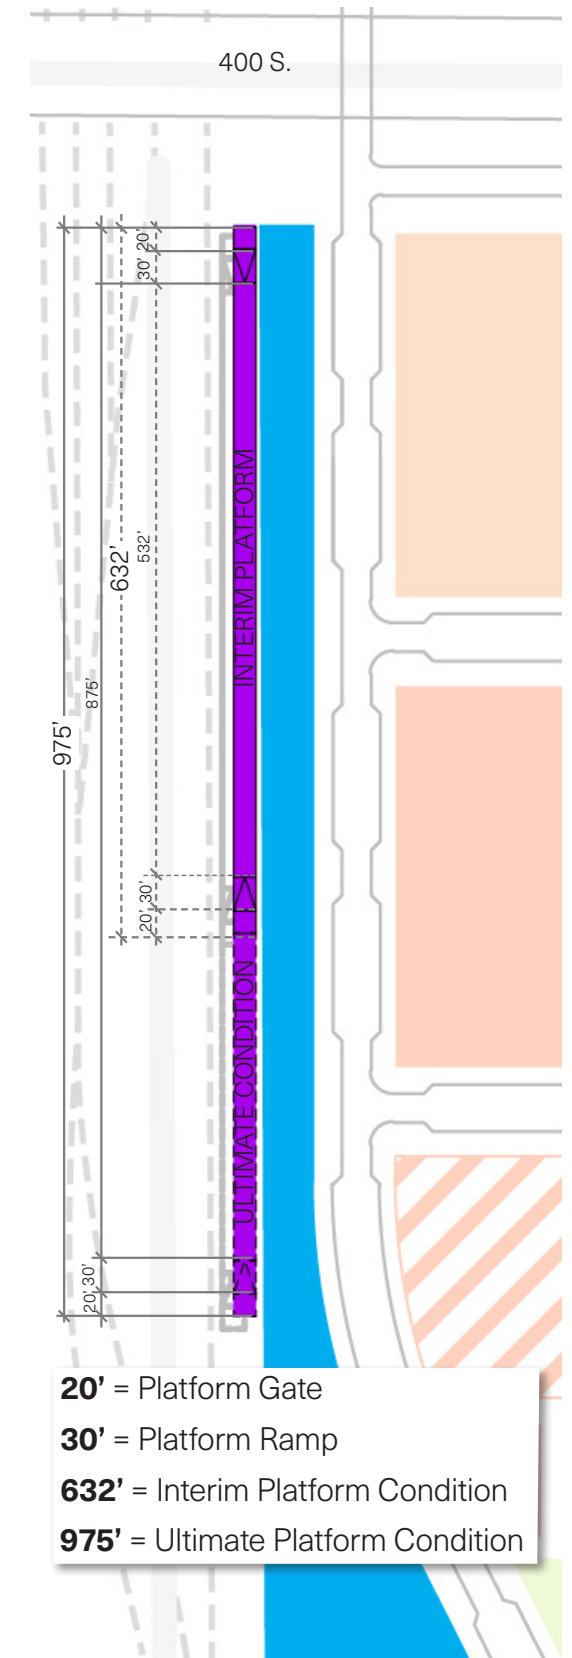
Recommended interim and ultimate platform build-out. Dimensions informed by UTA recommendations and standards.
